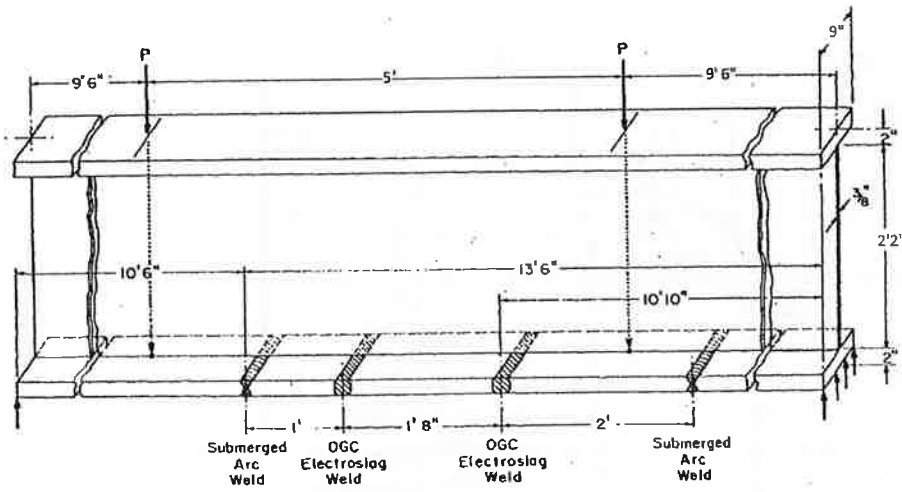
Schematic illustration of the full-scale I-beam containing electroslag weldments for fatigue testing (Wood et al, 1987)
